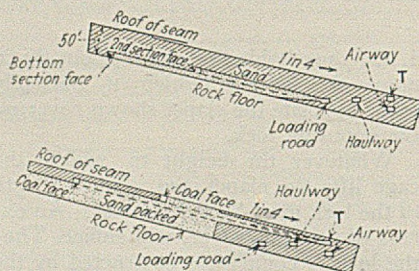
Upper Elevation Showing Section Along *HG* in Fig. 1; Lower Elevation Shows Manner in Which Top Branch of Seam Will Be Extracted.
